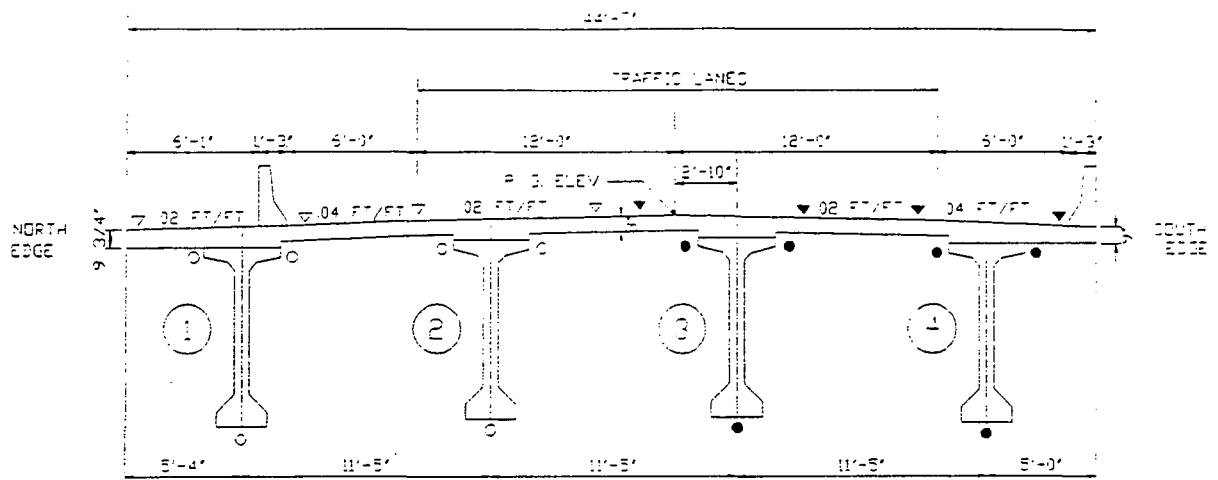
BRIDGE OF STAINLESS STEEL
